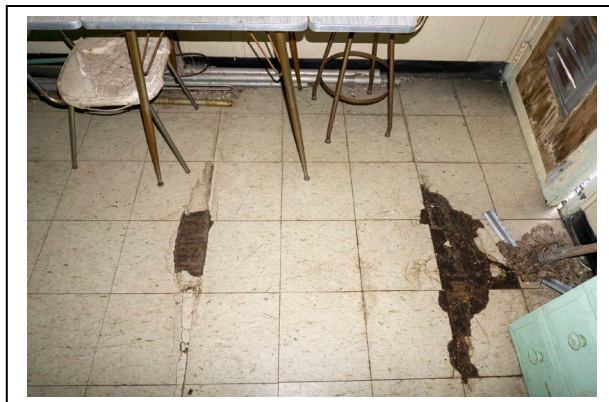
New Feldtmann Fire Tower cab flooring, looking south. Photo by Natalie Young, 2019.
